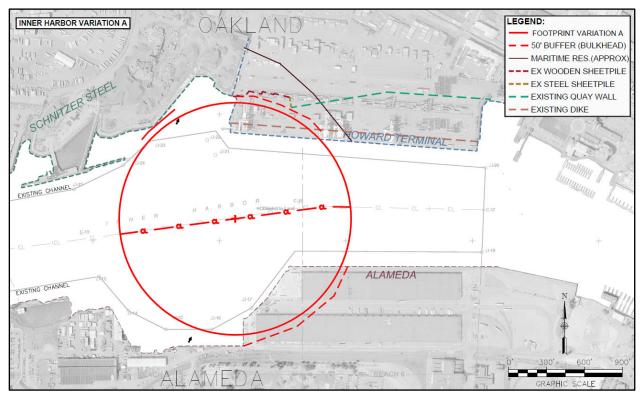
Inner Harbor Turning Basin Proposed Footprint
